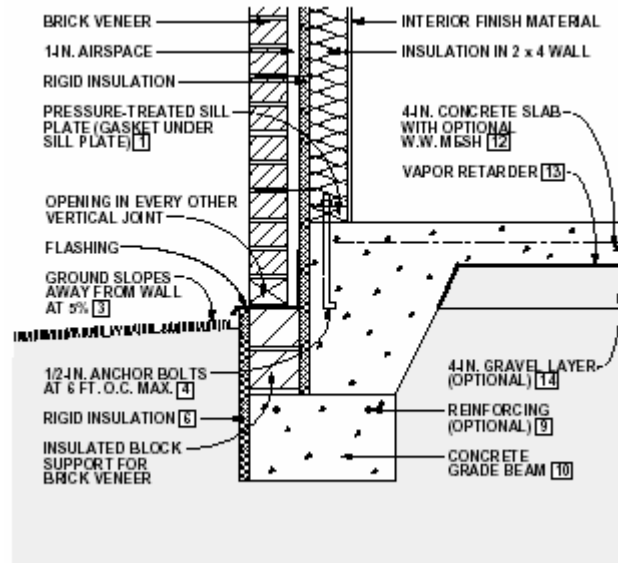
illustrates a slab-on-grade foundation with an integral grade beam. This differs from Figure 4-9 in that the above grade wall is wood frame with brick veneer. The rigid insulation is placed vertically on the exterior face of the grade beam and extends upward into the cavity between the wood frame wall and the brick veneer.
